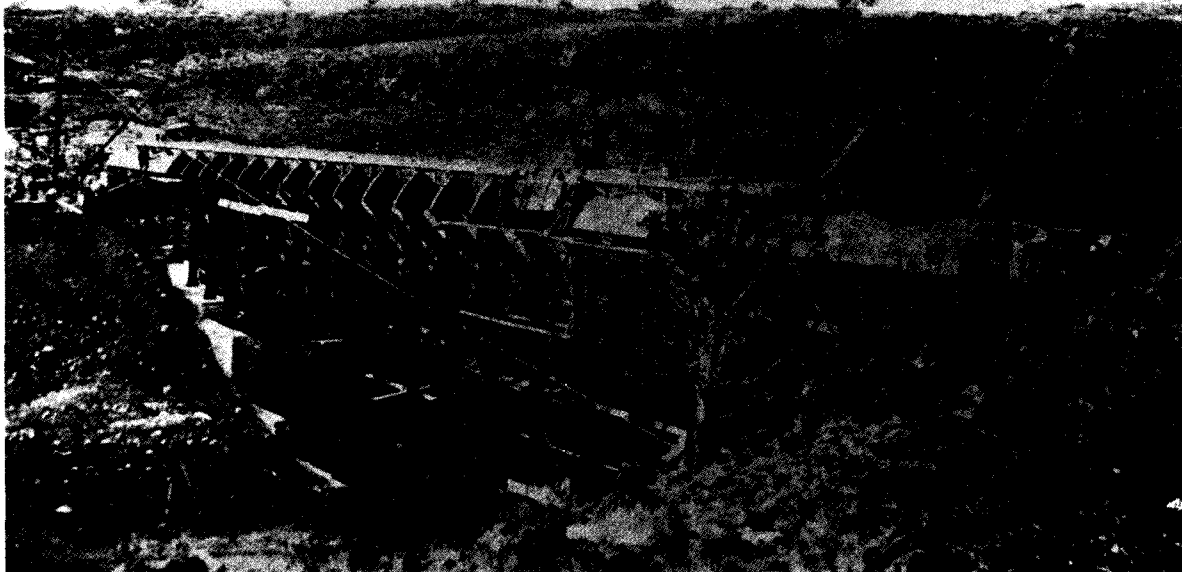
Downstream view of the Ash Fork, Arizona, steel dam during closing phases of construction, 1898. Note the steel bents used to support the curved steel plates facing upstream. From *Engineering Record* 37 (April 9, 1898): 507.
